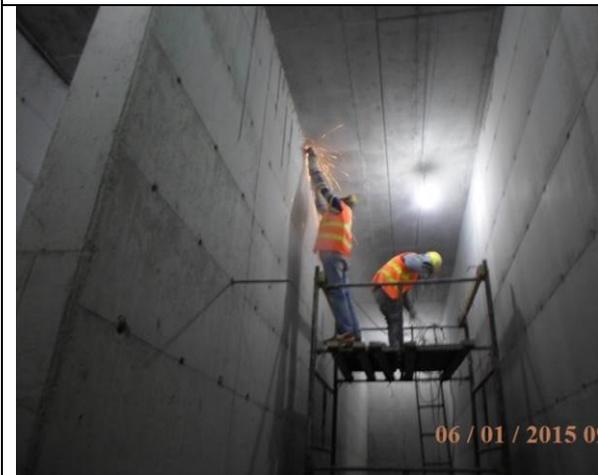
t of January, 2015: Start and finish fixing and welding galvanized steel angle for Electrical Metering building trench.
